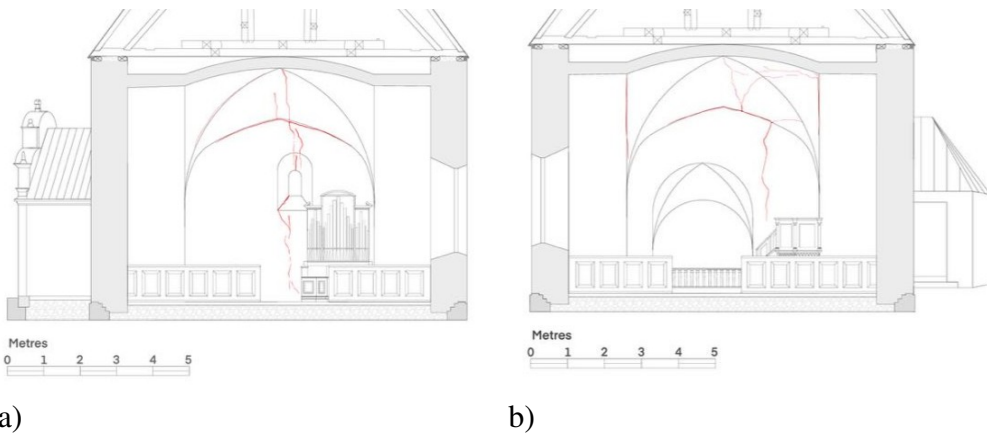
Section view of Skörstorp's church from crack-investigation 2025 with cracks marked in red a) West and b) East
